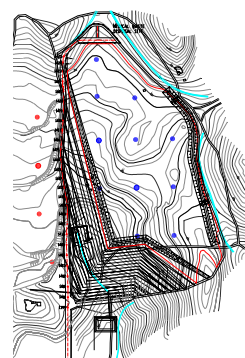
Installation Plan of Gas Removal Pipes in UCDS
